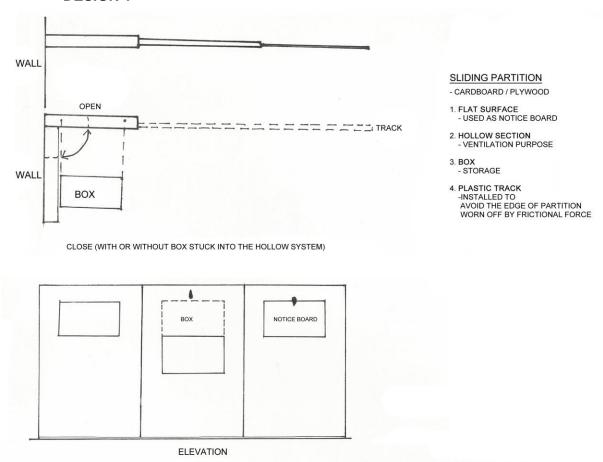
Illustration shows design of sliding pocket partition from plan and elevation views.
